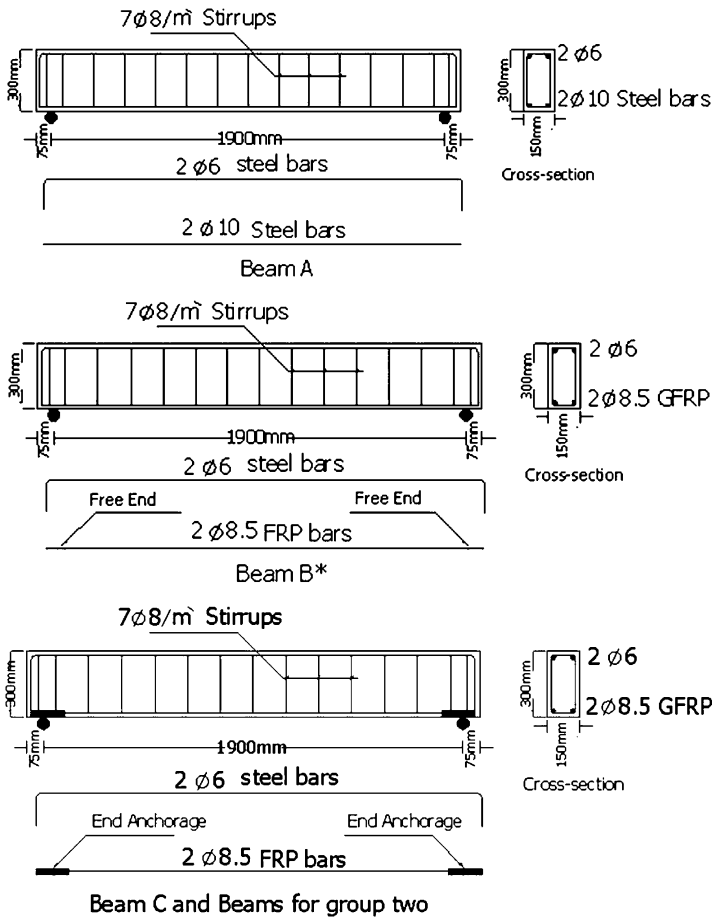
Concrete dimensions and reinforcements of beams. (*A control specimen for specimens reinforced with FRP rebars.)
